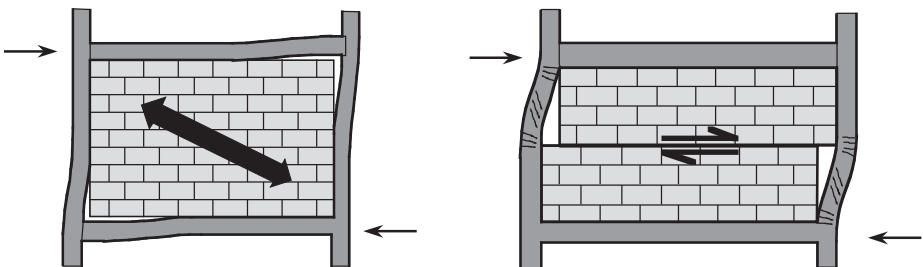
Damages to R.C. frame due to masonry infill wall
